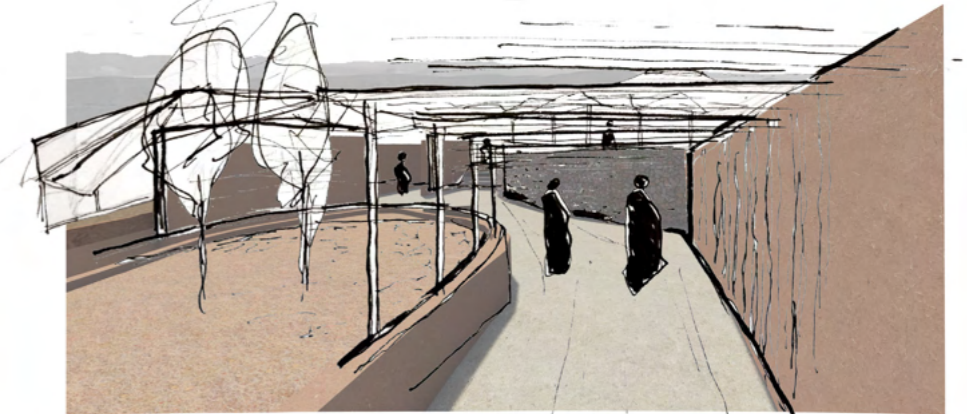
Design Approach 2 Ritual Pavilion Perspective (Author, 2021)
